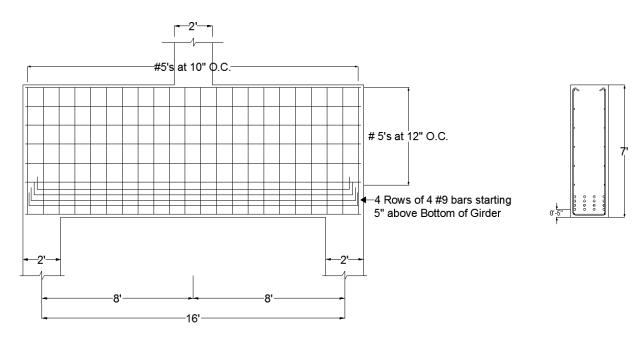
STM Design Example 3 - Final Design Cut Sections
